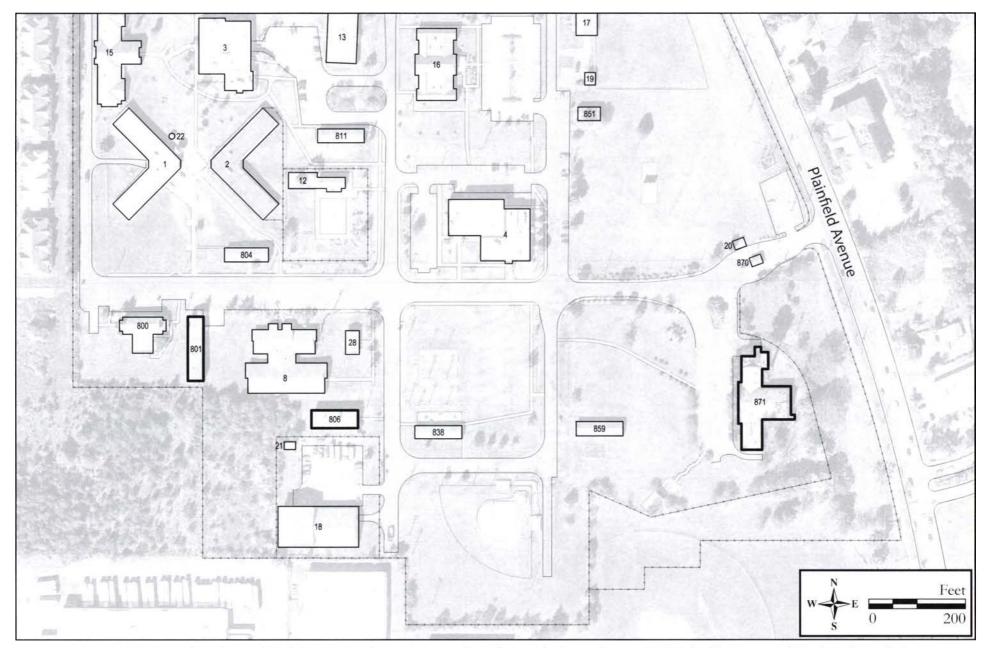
Site Plan, showing locations of Buildings 801, 806, and 871 at the Edison Job Corps Center (DCM Architecture and Engineering 2016).
